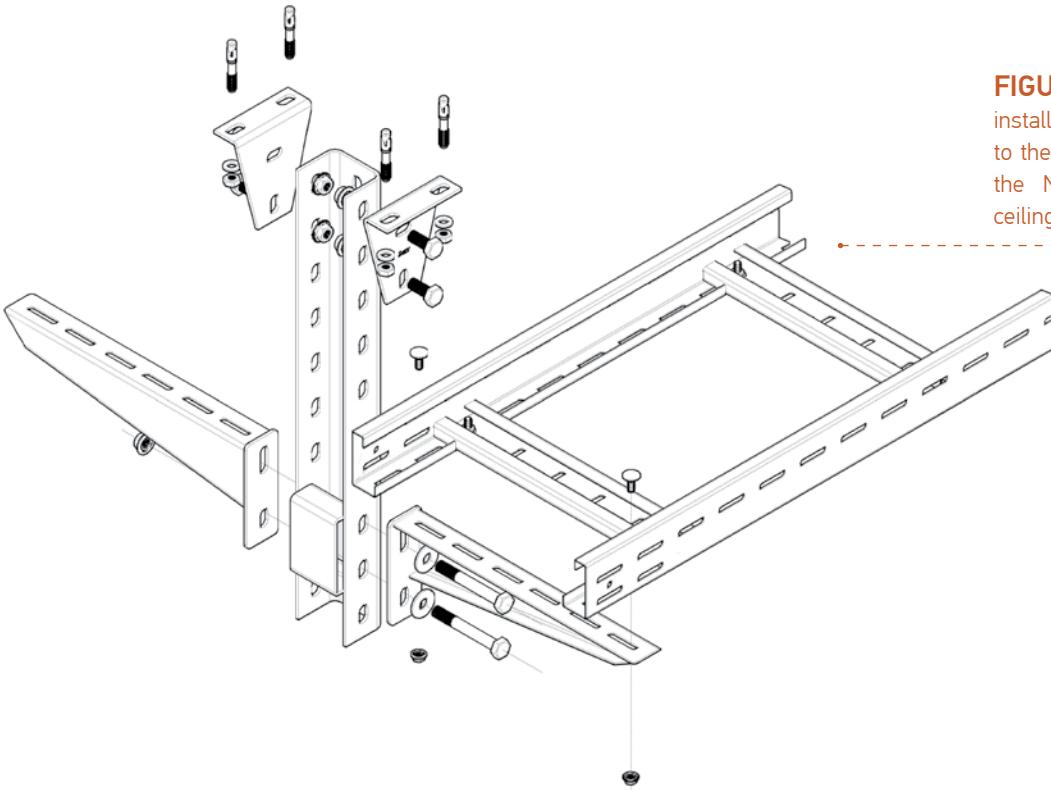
Example of the installation of the cable ladder to the ceiling with the help of the NKP-SNU + NKP-SNP ceiling bracket
